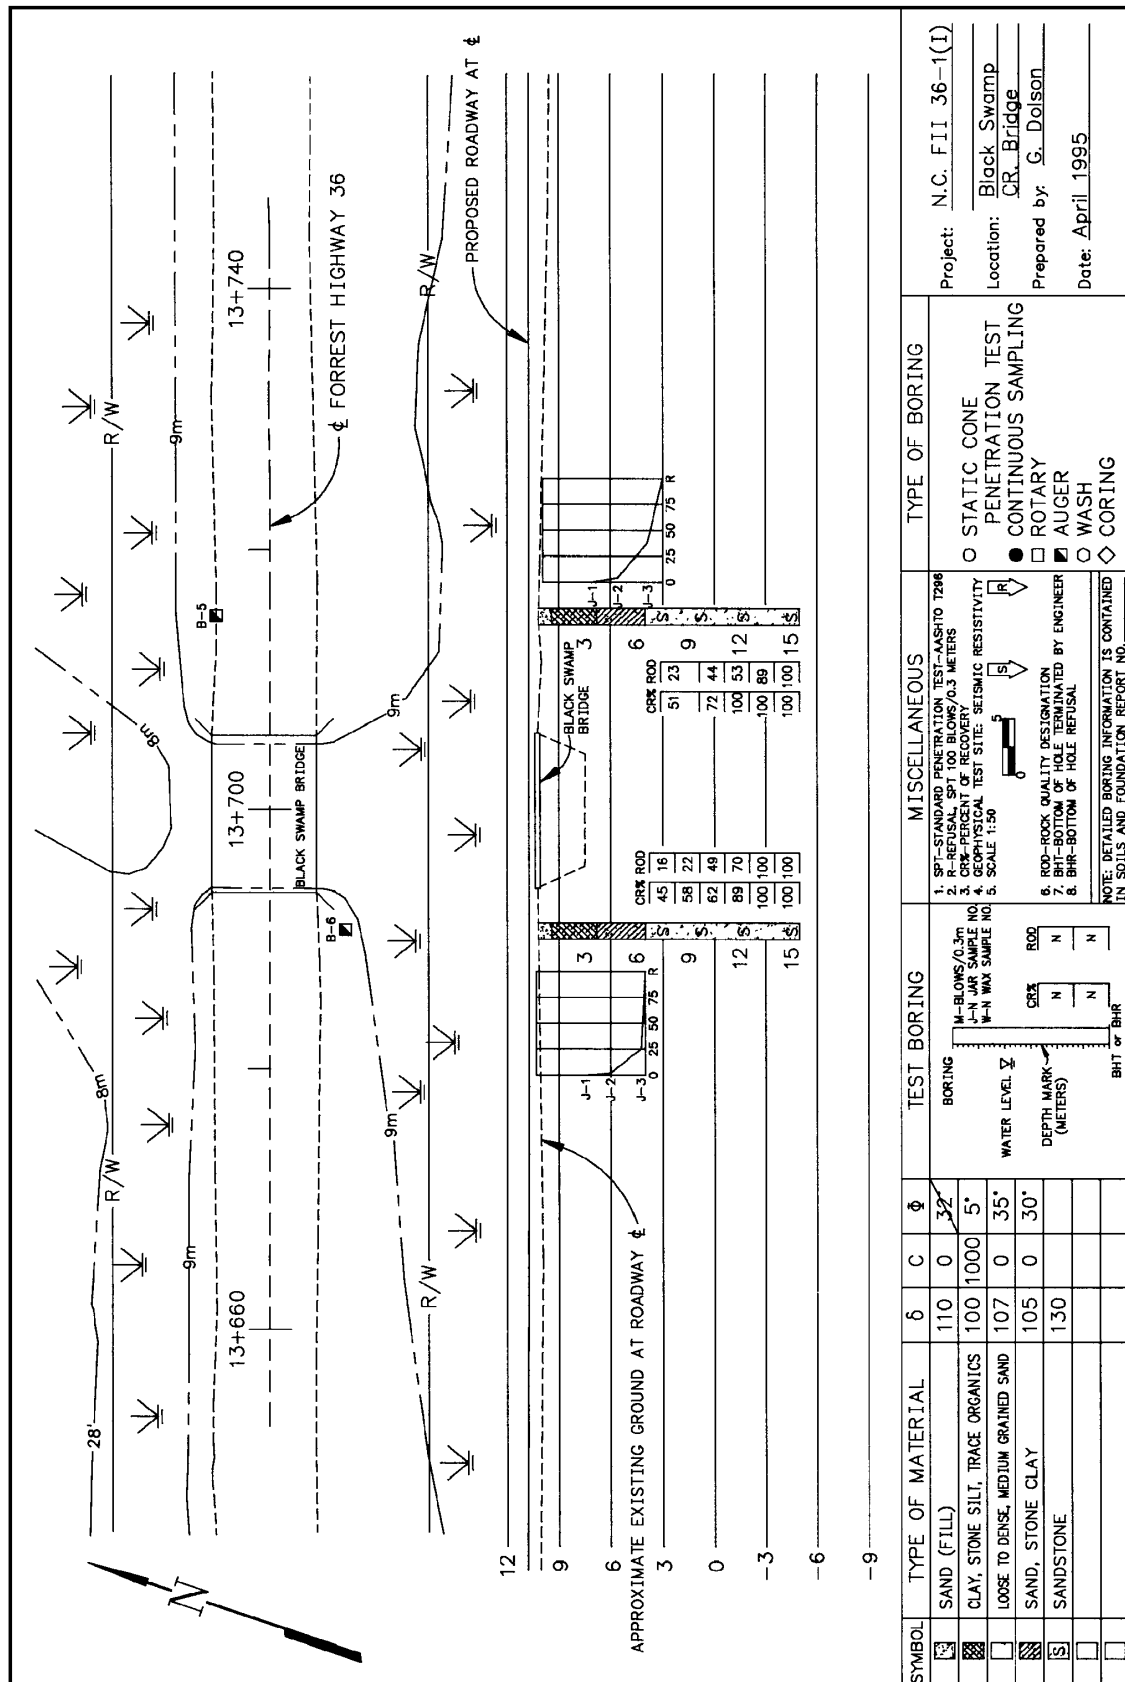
B SAMPLE OF A SOILS AND FOUNDATION PLAN AND PROFILE SHEET
